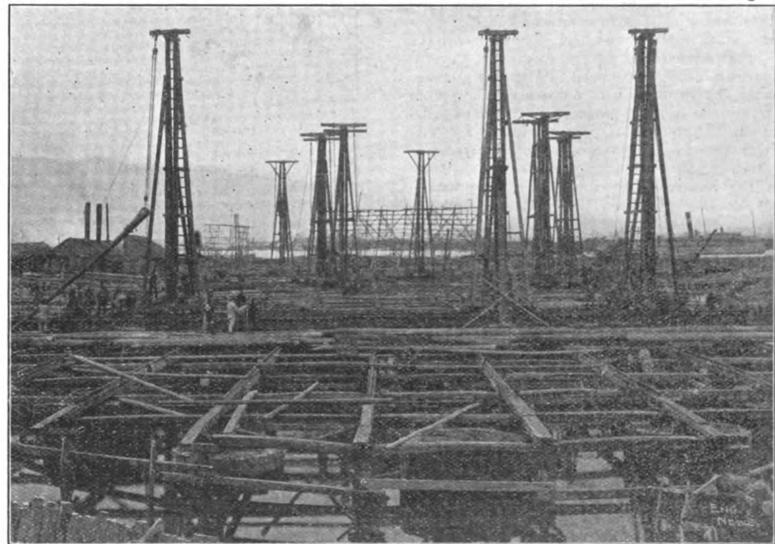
VIEW SHOWING TEMPORARY STAGING AND PLANT FOR DRIVING FOUNDATION PILES.
